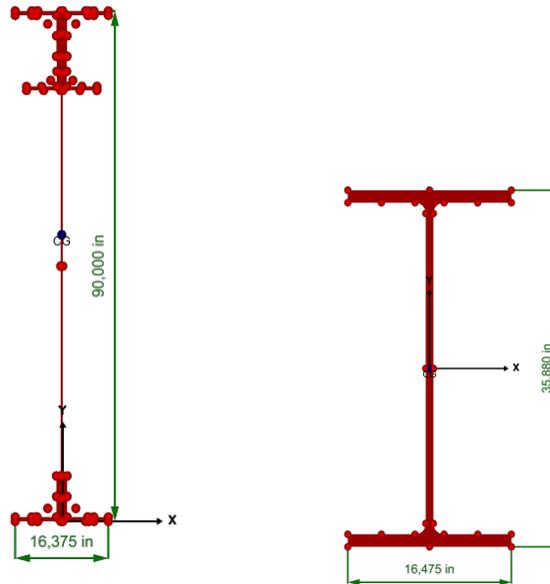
Cross sections of the 57' (left) and 23' long (right) girders
